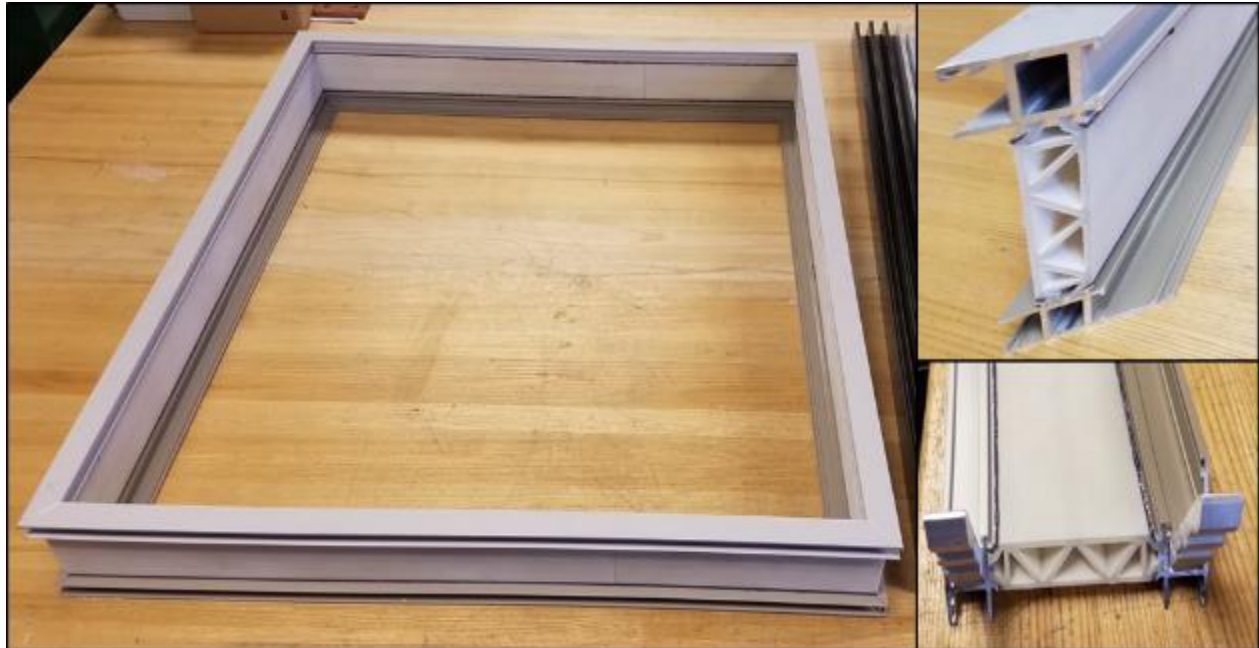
Image of Truss Thermal Break, Glazing Bead, and Thin-Triple Glazing Assembled Between Kawneer OptiQ™ Aluminum Profiles
